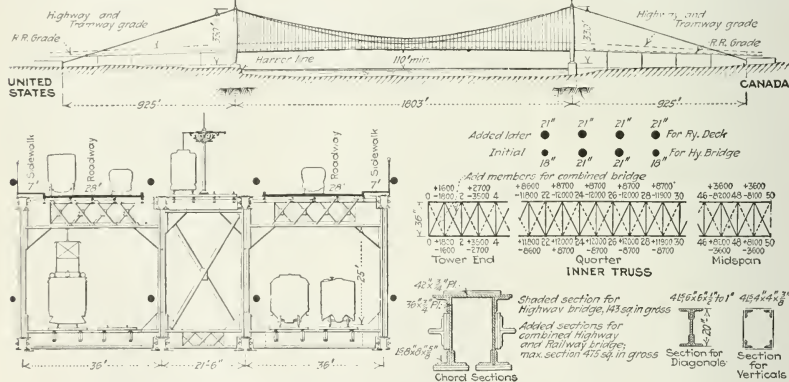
Windsor-Detroit Bridge, Dimensions and Structural Arrangement, Truss reinforcement when second deck is added.
